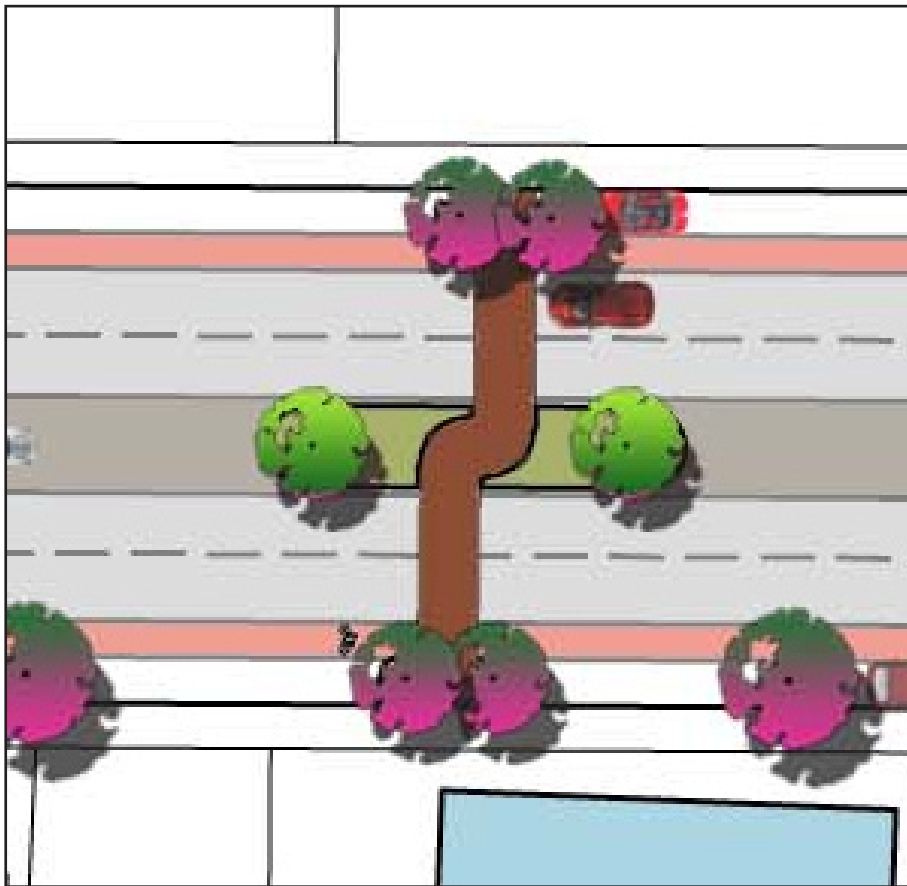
New crosswalks, bike lanes, and landscaping at Santa Anita and Merced.
